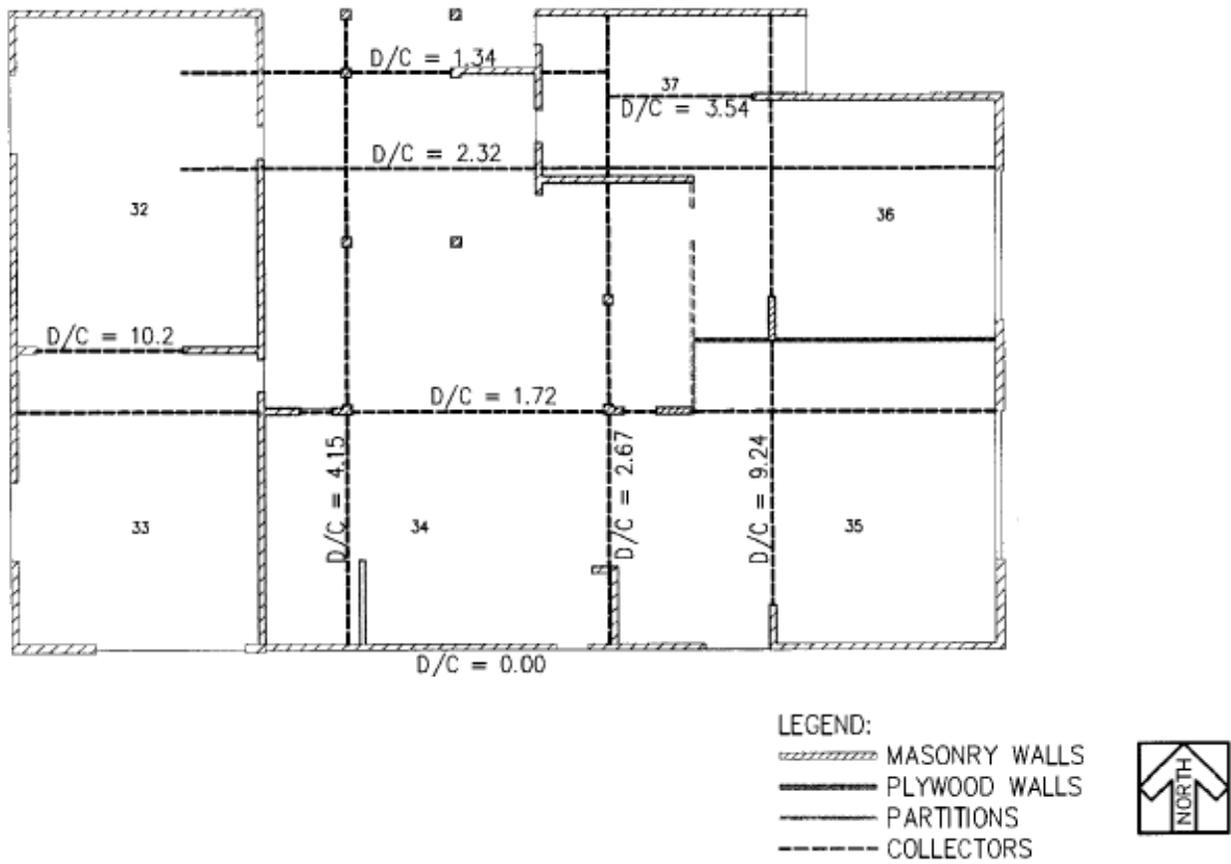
Building C demand-to-capacity ratios (D/C) for the connection of the roof to the shear walls.
